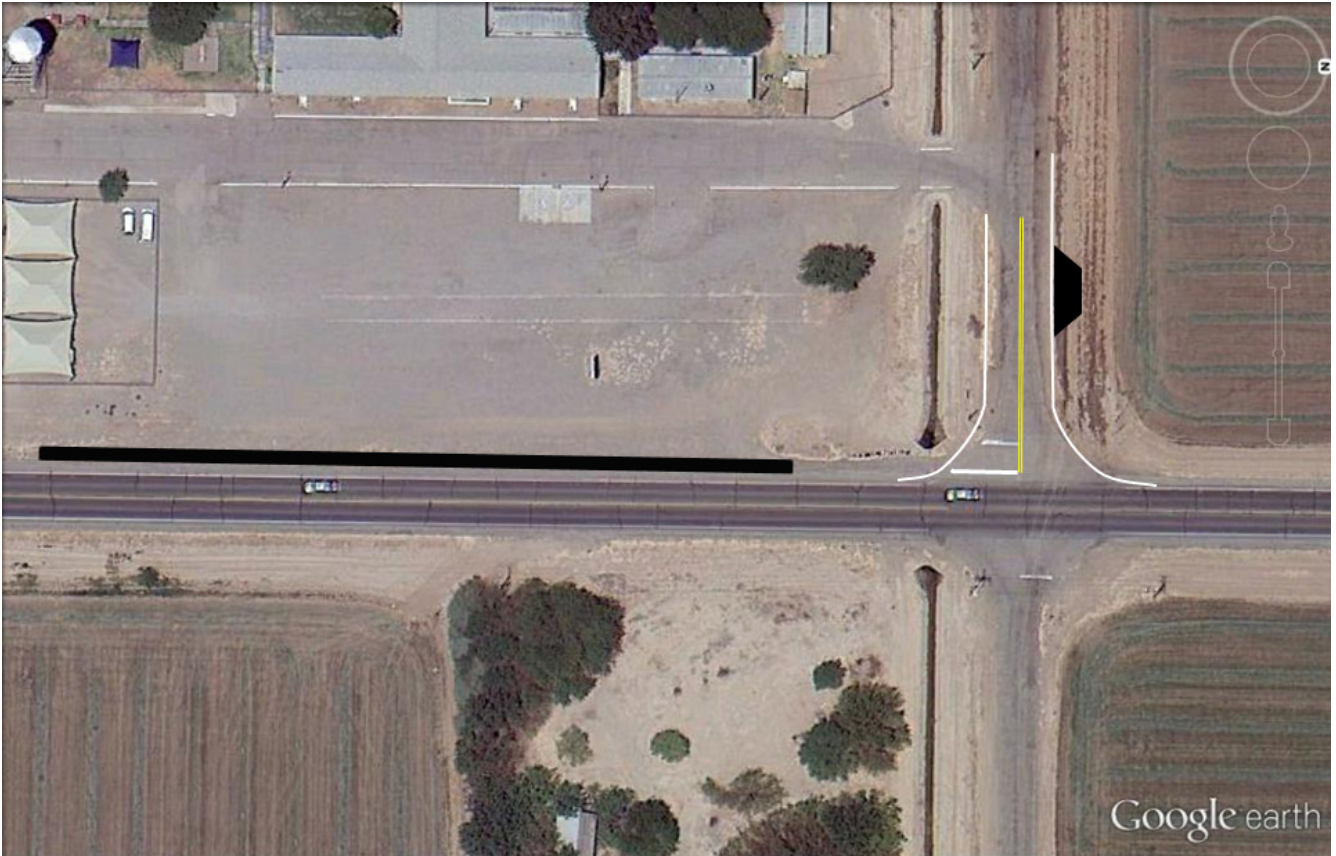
Sketch of Recommendations for Mohave Road at Head Start School
